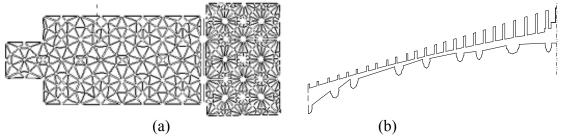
Aspects of the vaults: (a) plan and (b) transversal cross-section of the nave.
